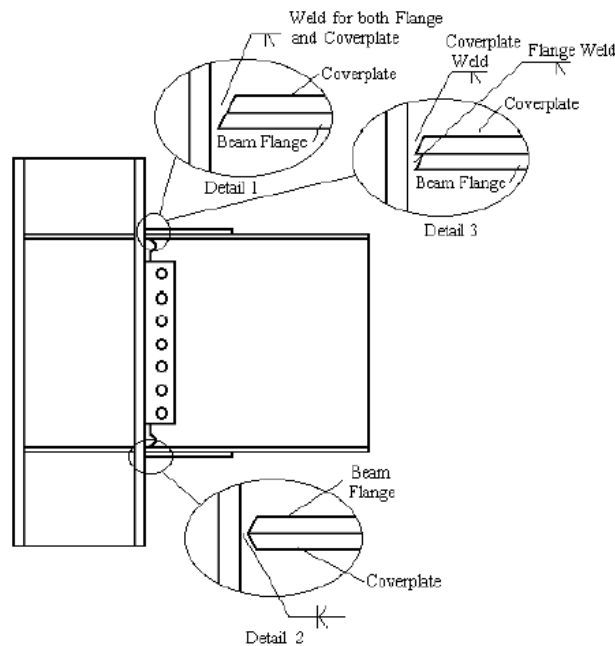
Weld details for plate connections (after FEMA 355D, 2000).
